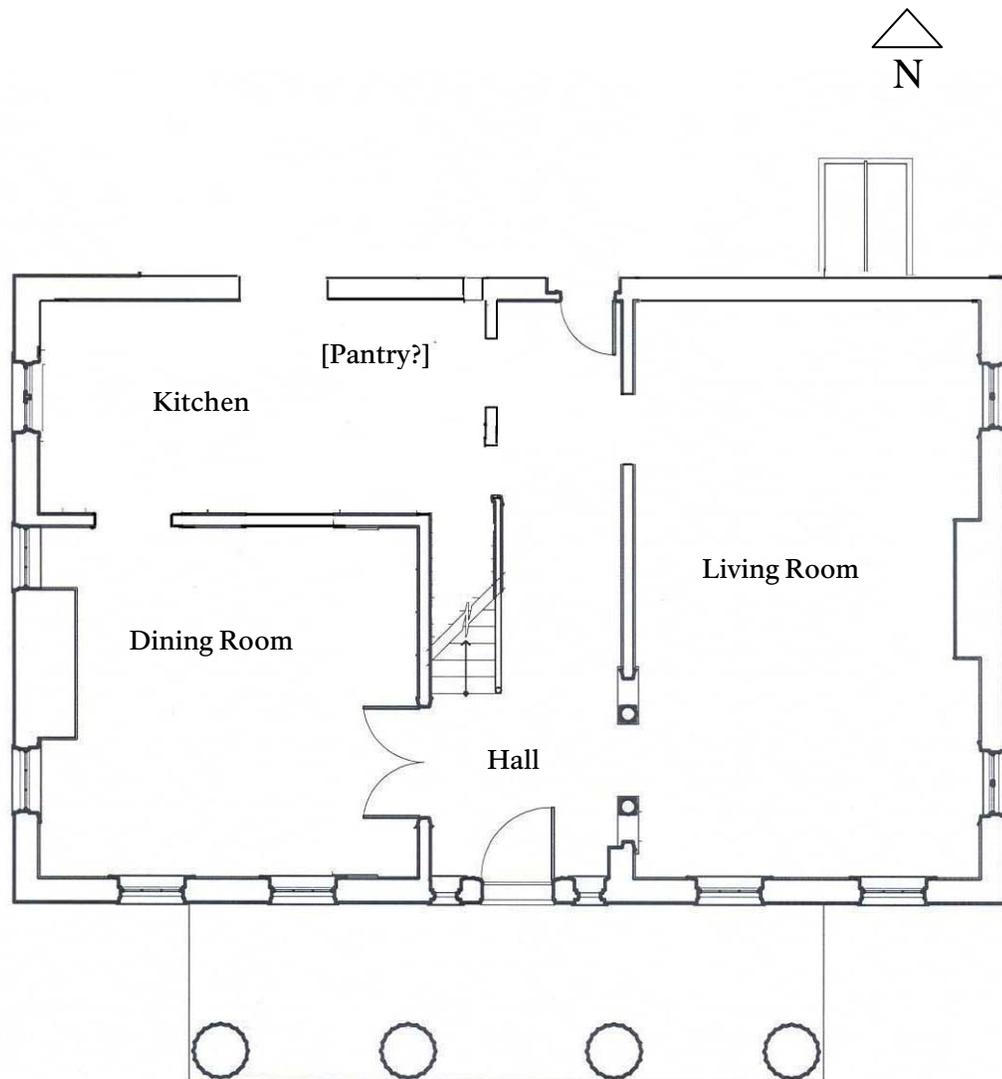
Conjectural first floor plan of the Hunt House, circa 1920. Not to scale.
